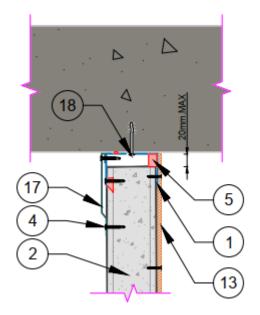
Dual wall system with vertical wall between horizontal walls – vertical head detail – option 01
